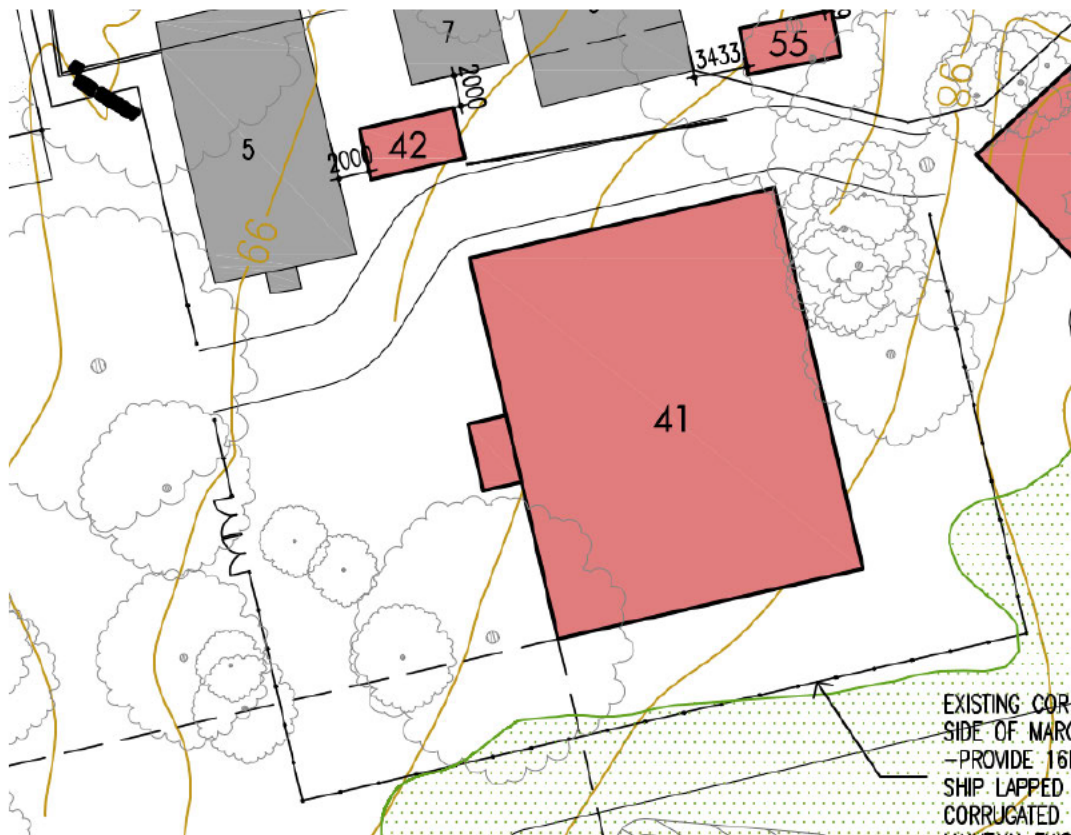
Site Plan - function marquee, associated patron/ staff amenities building site plan and fencing
